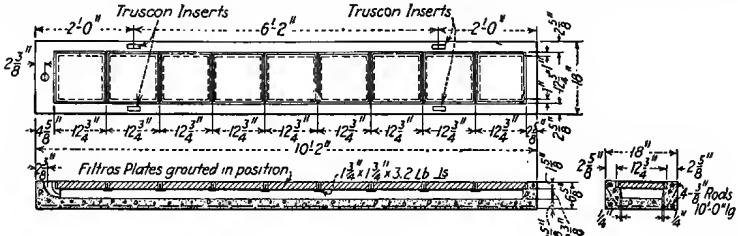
Concrete plate container at Milwaukee sewage-treatment plant.
